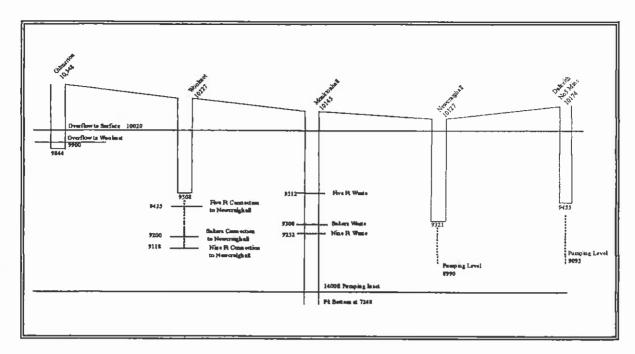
Plan showing Interconnections around Monktonhall Colliery
